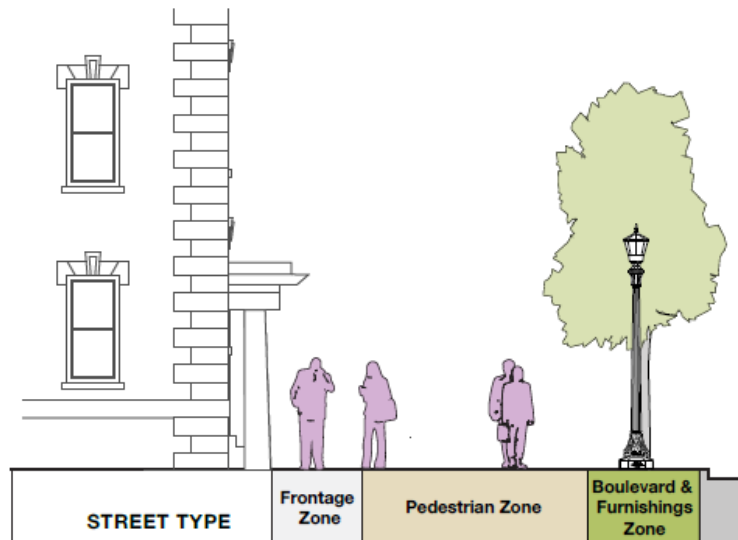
City of Saint Paul Sidewalk Zones (Source: City of Saint Paul Draft Street Design Manual)
